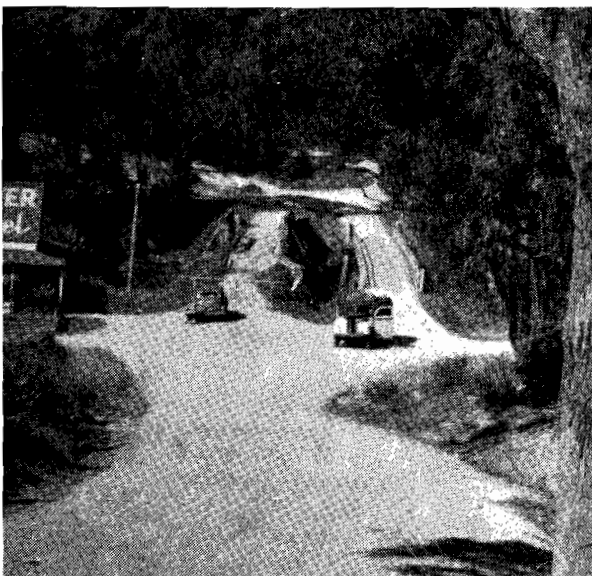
Old and temporary bridges on Walhalla Road over Tyers River.
